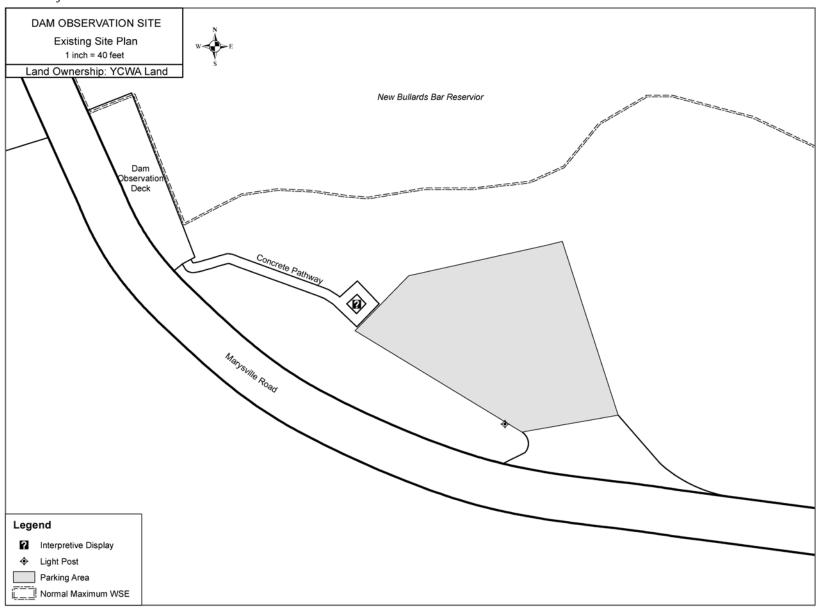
Existing site plan with proposed improvements for Dam Overlook Observation Site.
